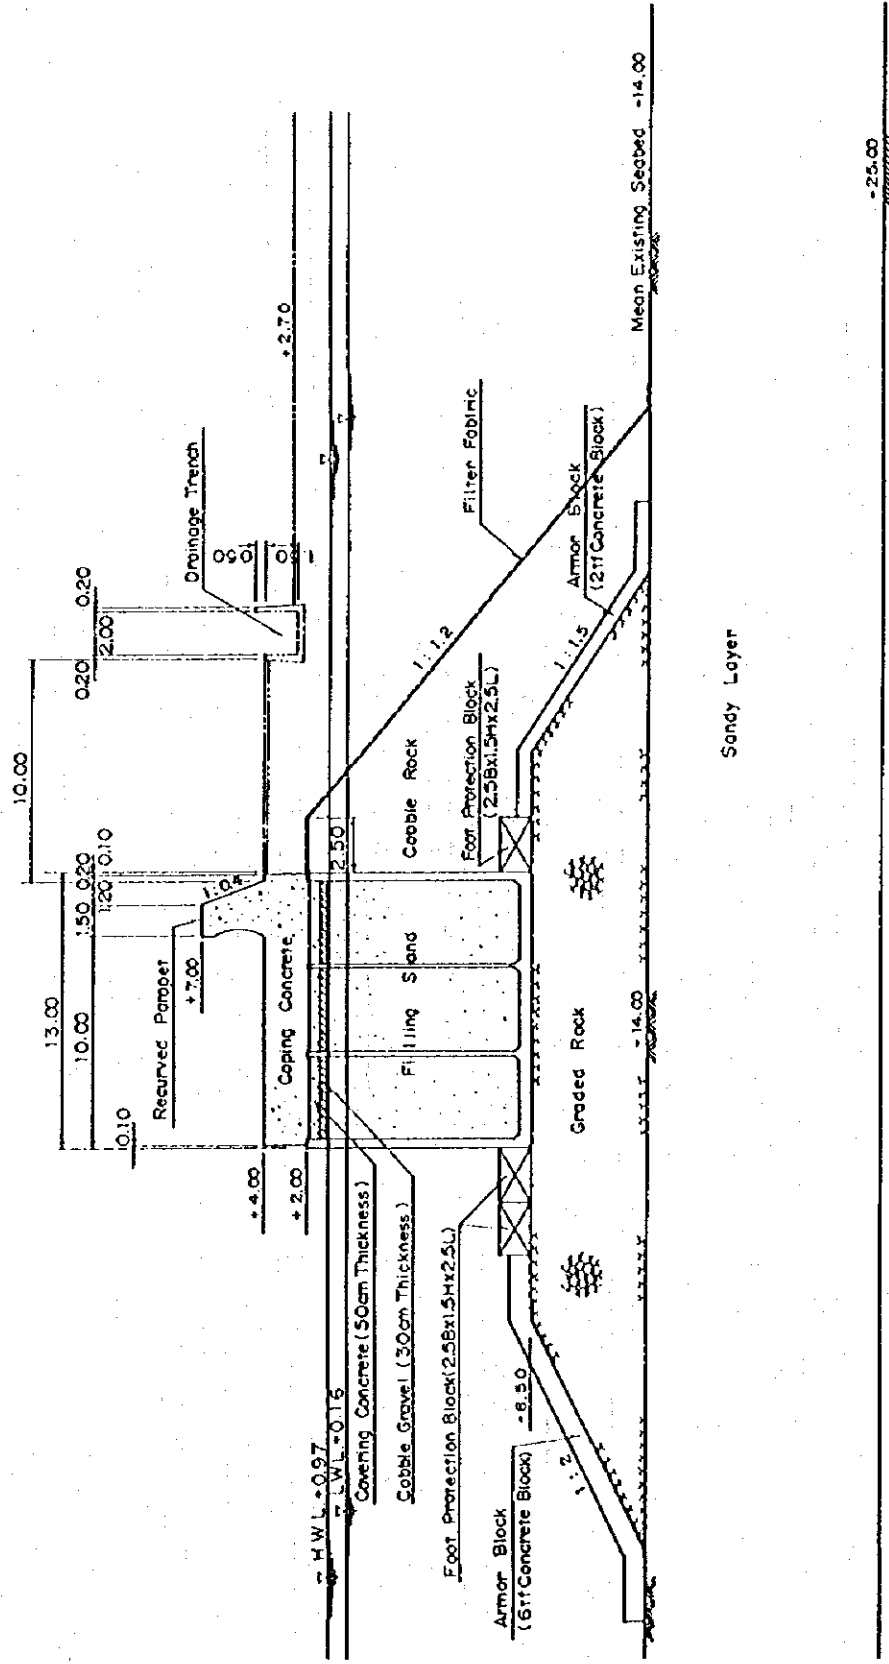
Standard Cross Section of -16.0 m Quaywall ⑧
